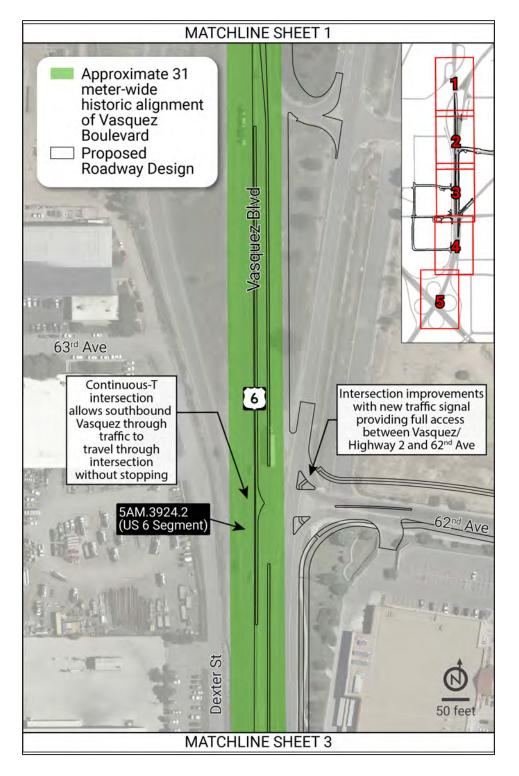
Vasquez Boulevard Proposed and Existing, Sheet 3
